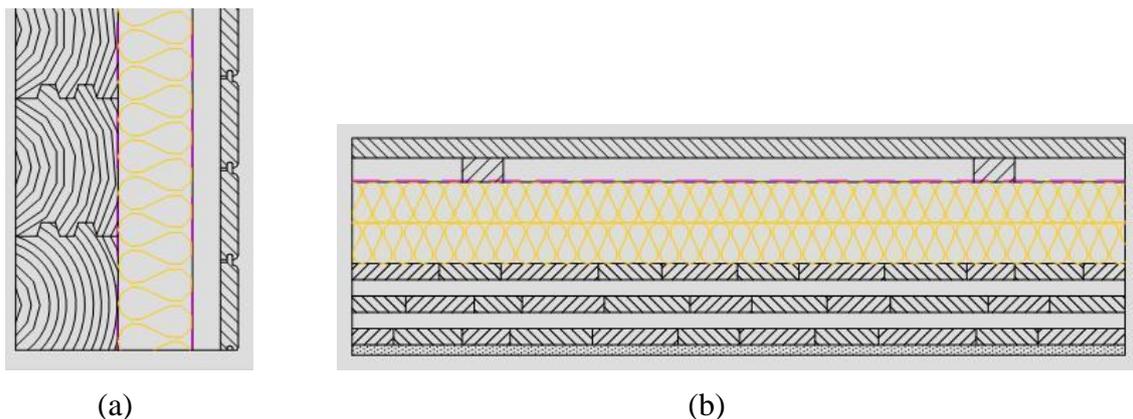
Massive timber wall structures; (a) log house wall; (b) CLT wall.
